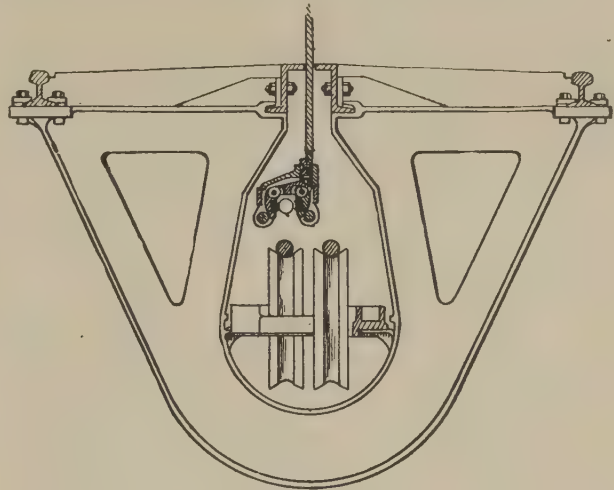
SINGLE TRACK CABLE CONSTRUCTION.
